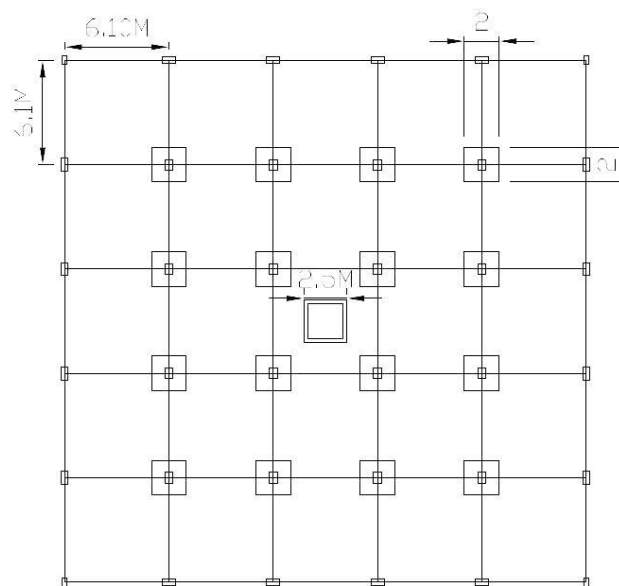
Plan View Of G+12 Storey Structure Case 2 Used For Study
